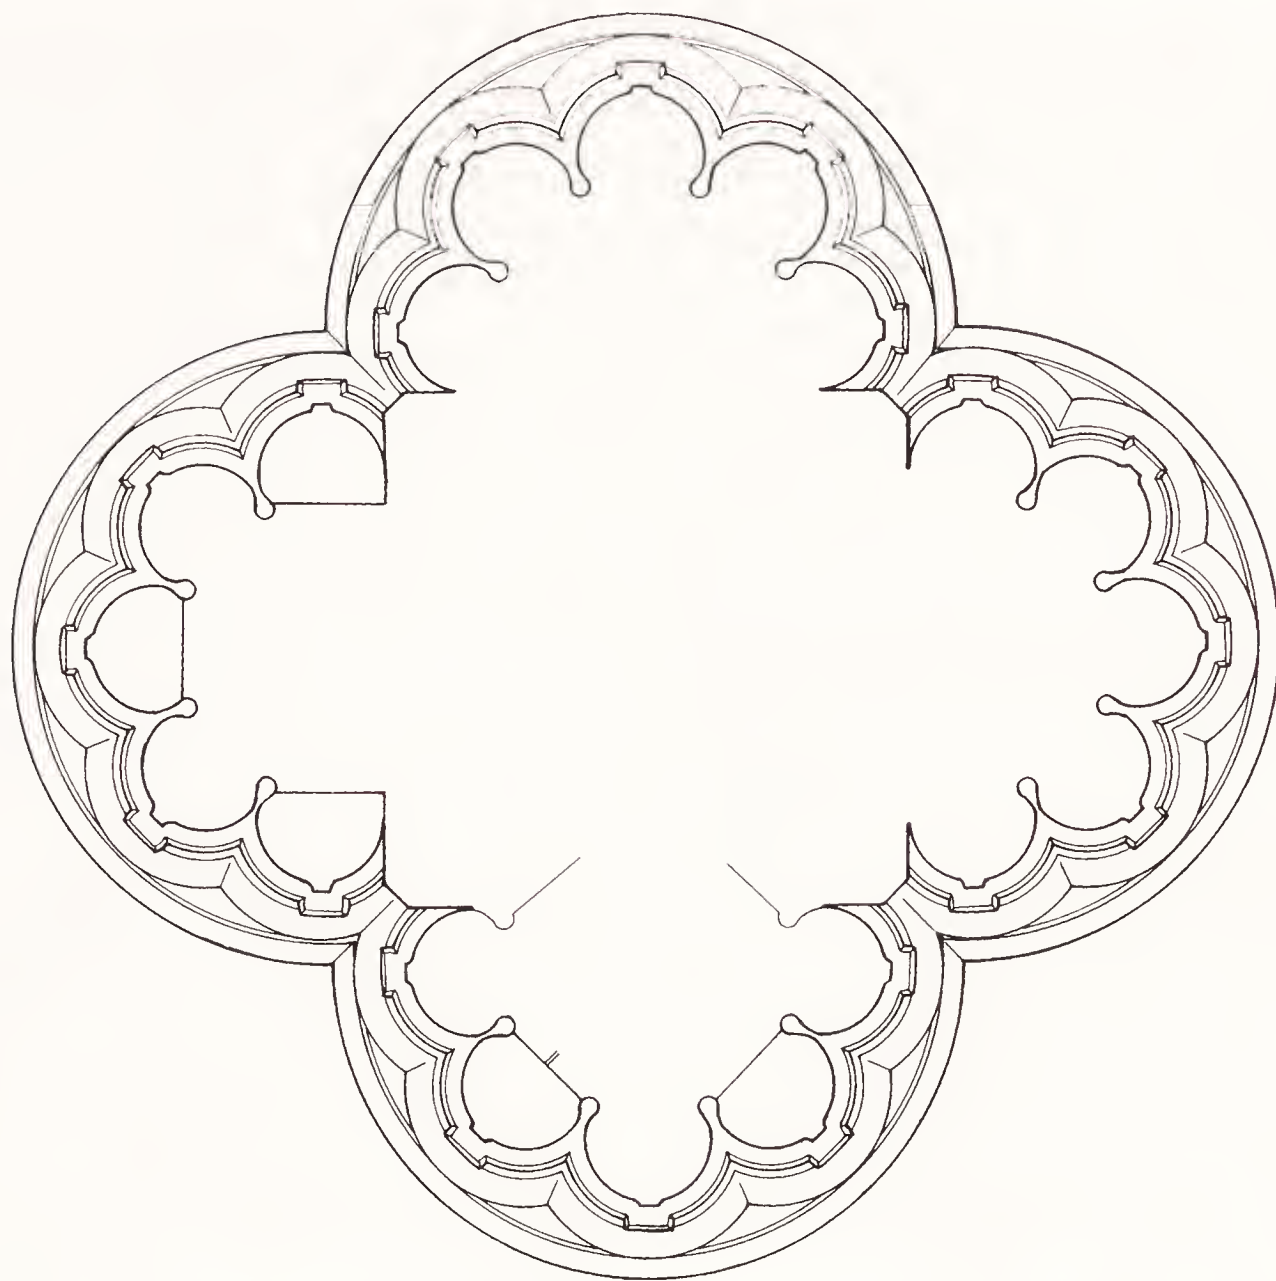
Detailed plan of western tower pier (Scale, 1:40).
